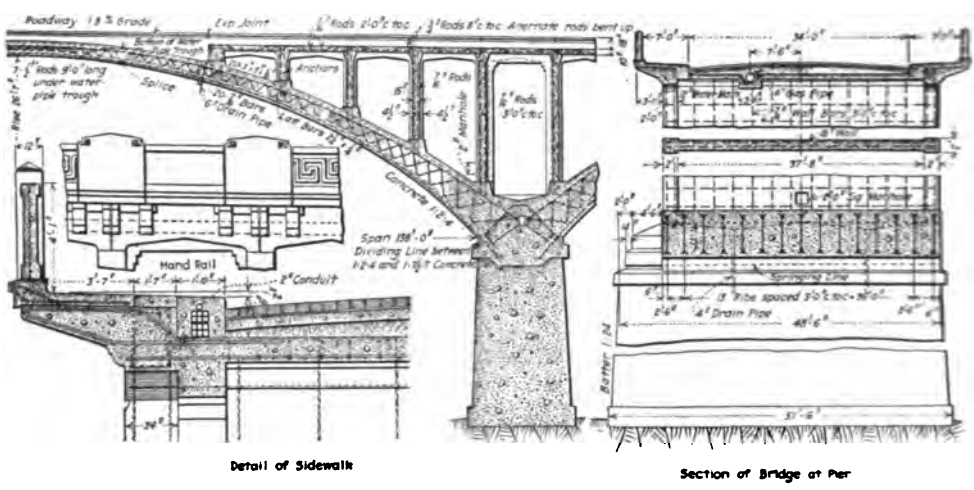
Details of Broadway bridge across the Oswego River at Fulton, N. Y.
